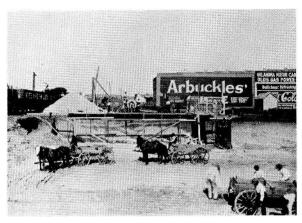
Digging Foundations, John Deere Plow Co. Warehouse, Oklahoma City, June 2, 1906. Oscar A. Eckerman, Architect.
